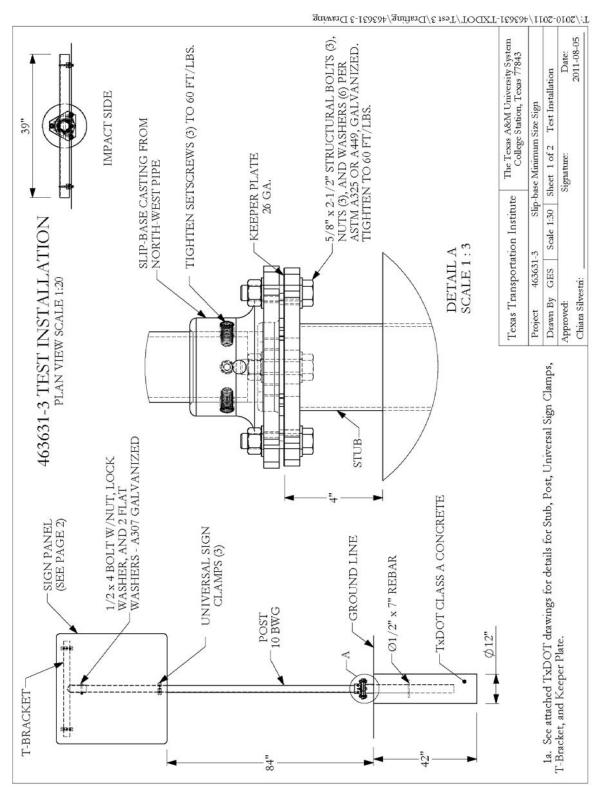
Details of the Sign Support System Used for Test No. 463631-3.
